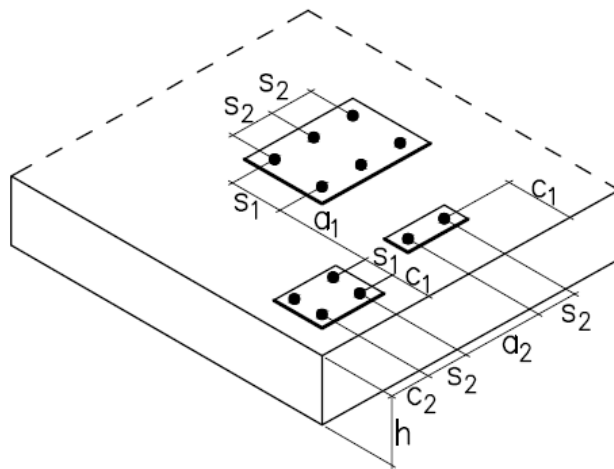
Definitions - concrete member, fastener spacing and edge distance
